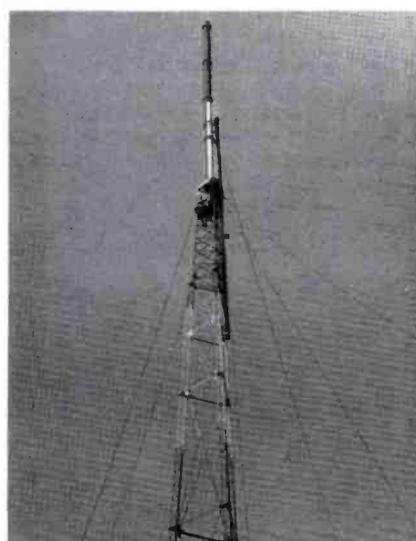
View showing the 4-section Pylon as it appears installed atop the supporting tower.
